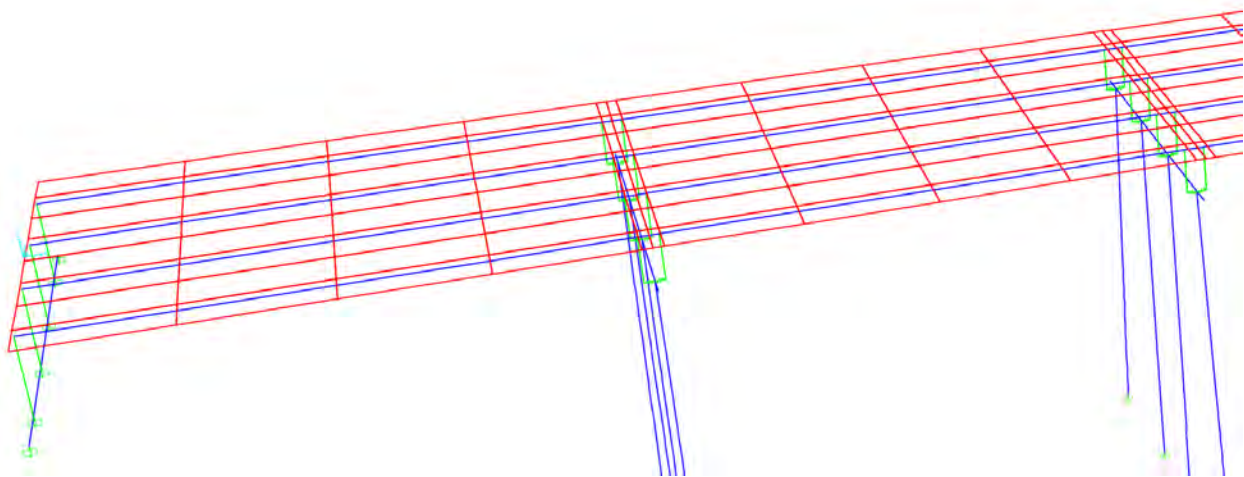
Bridge Modeler Shell Element Discretization for Interior and Exterior Spans
